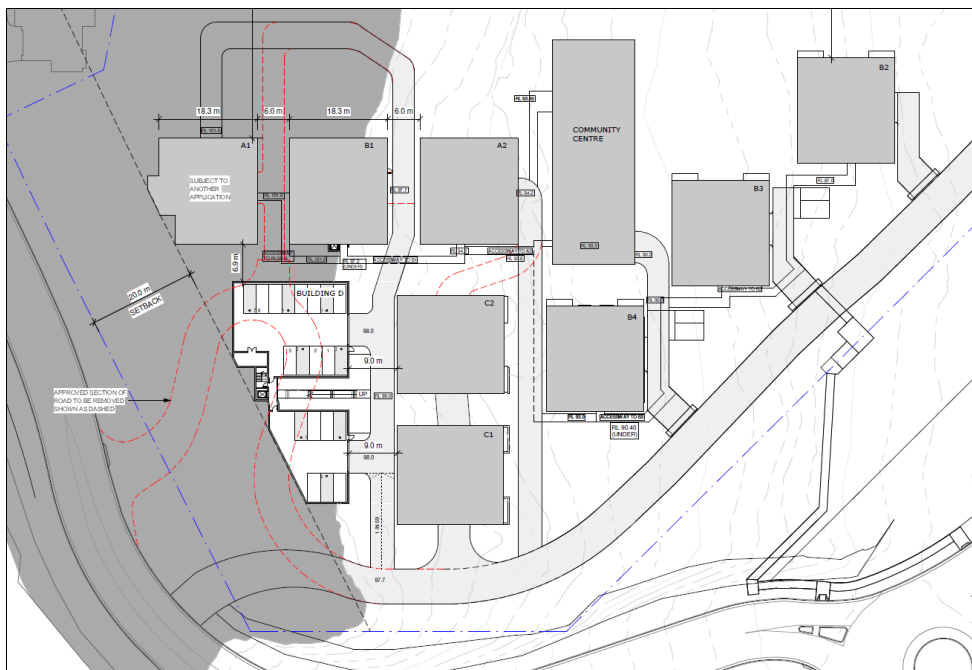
Position of building “D” proposed positioned in the location of the approved “S” shaped driveway. Note that the existing driveways either side of “C1” and C2” (middle centre buildings) have been constructed differently to DA2009/0800 (as modified) without lawful consent. (see image 3 below)
